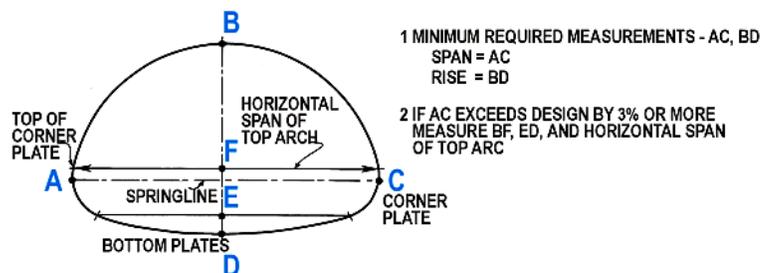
Shape inspection of structural plate pipe arch (Redrawn from Ballinger and Drake, 1995)
